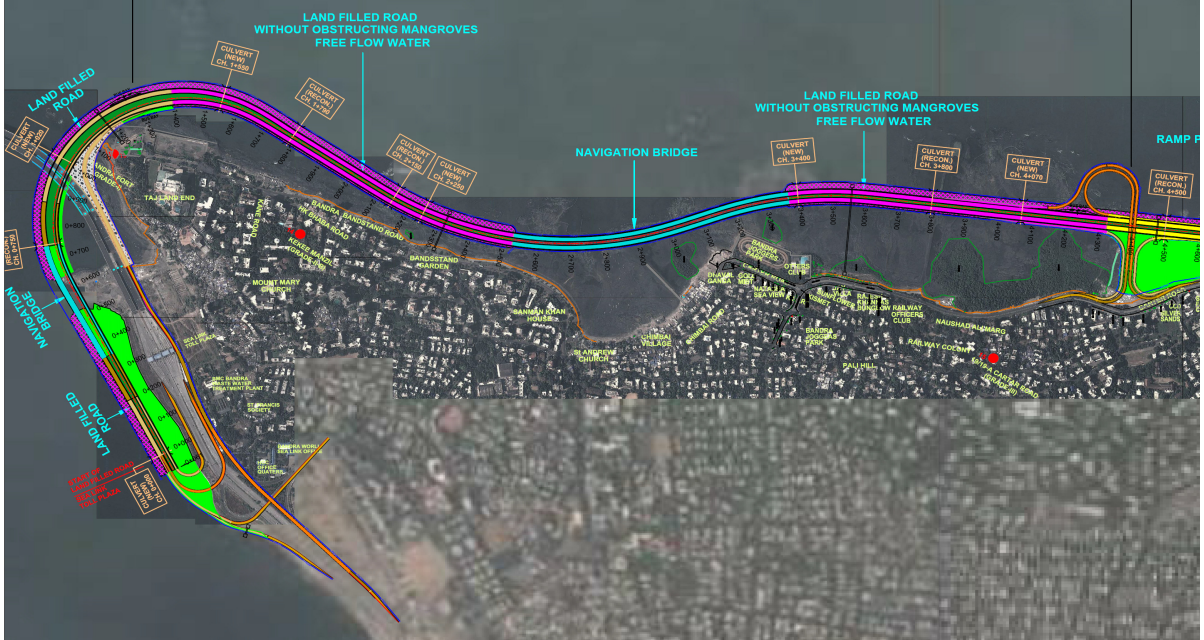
Section 5 Bandra End of Sea Link to Start of Tunnel
